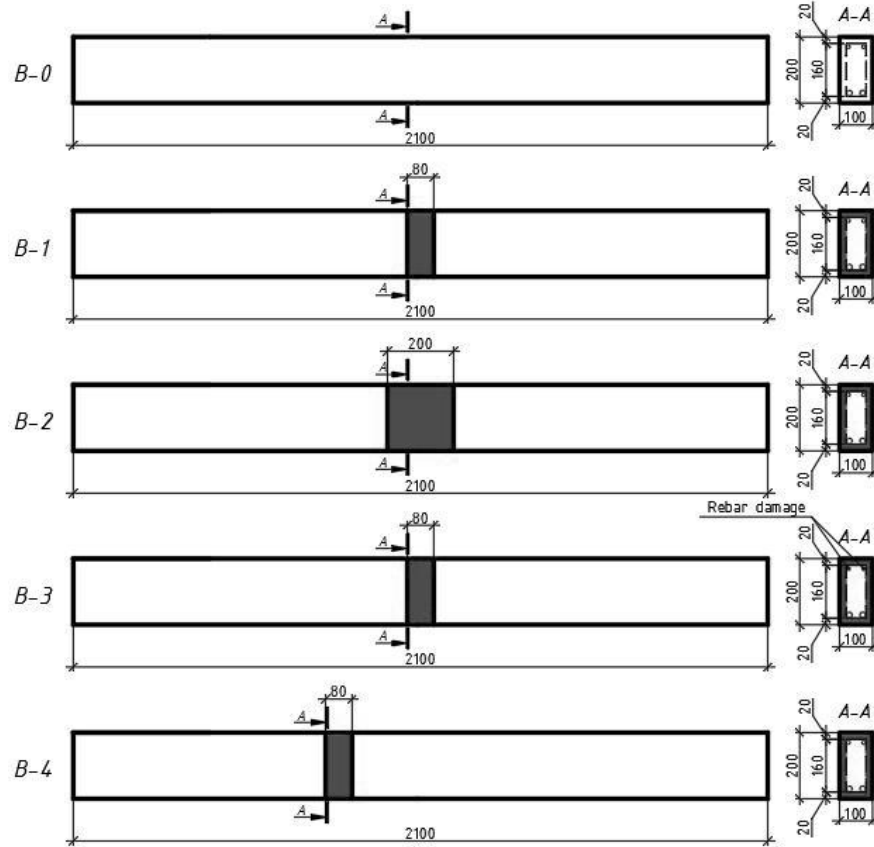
Scheme of experimental reinforced concrete beams with different types of damage
